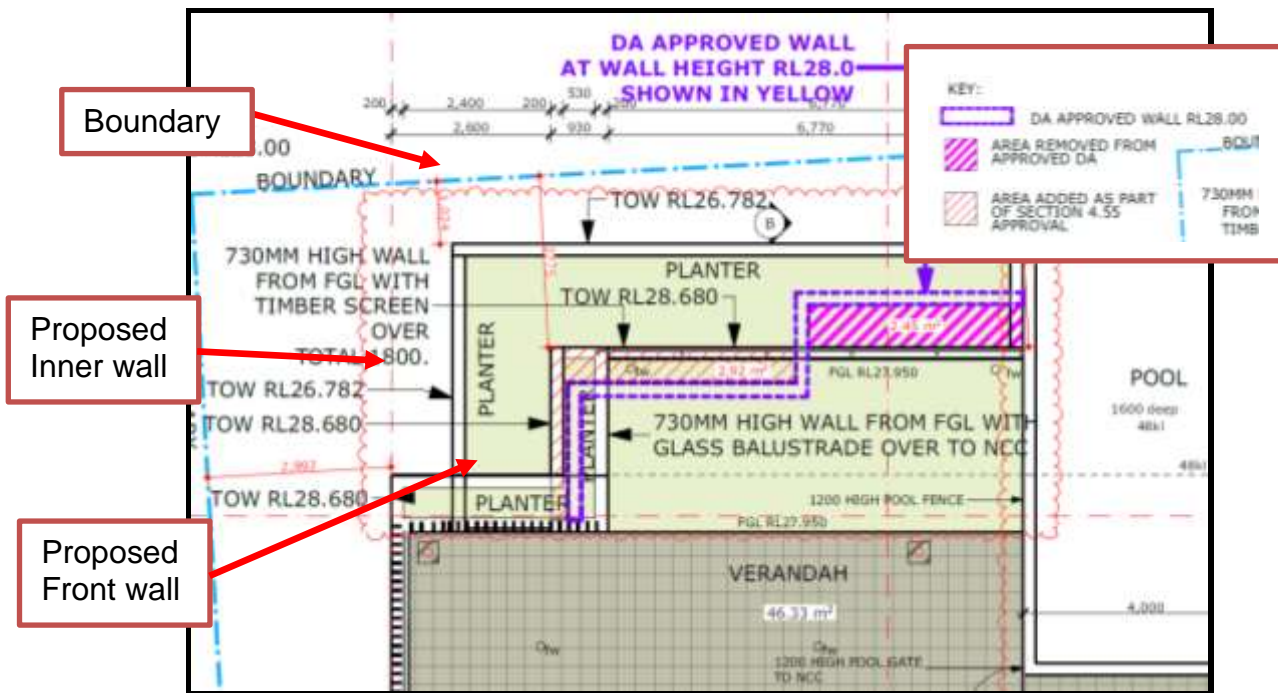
Proposed Retaining Walls in NW corner (Source: Issue L - David DeChiara, 24/5/2022)
